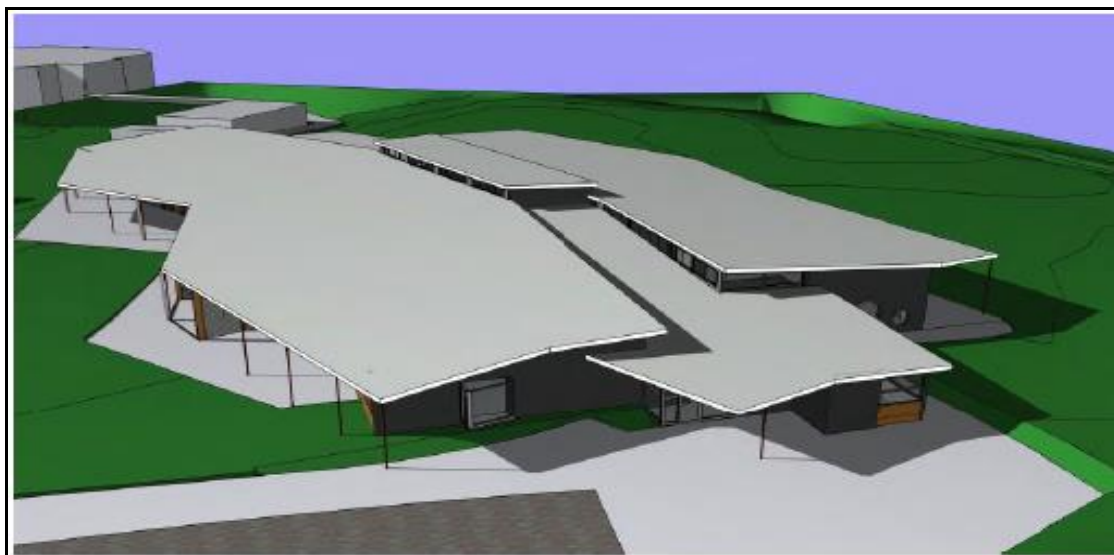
Proposal Plans – Aerial View – West - Public Entry - M2 Architecture
